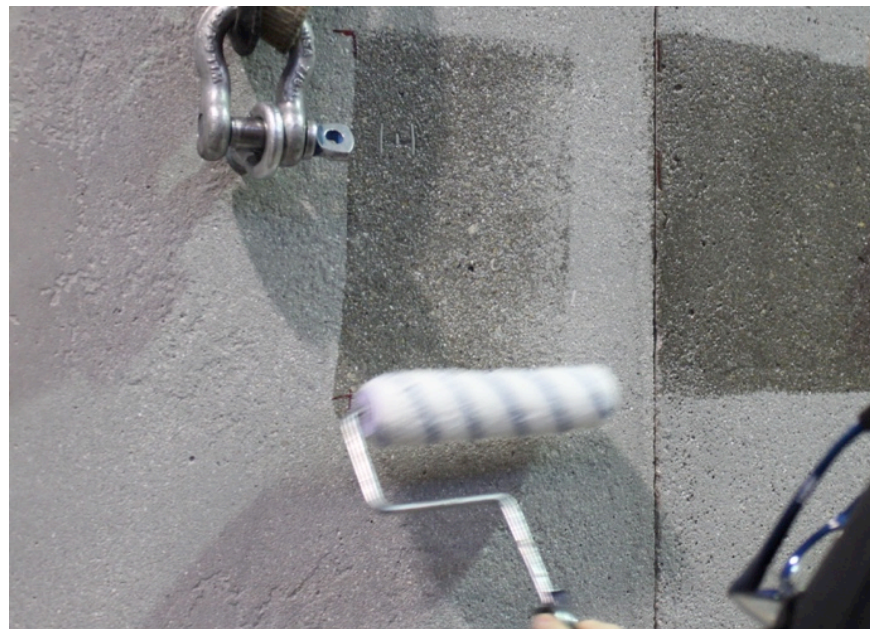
Step 1: Prime concrete surface with epoxy resin.
